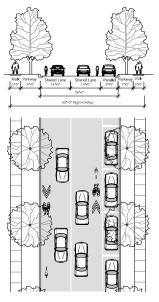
C (7). Ardmore Avenue 62' ROW- Alternative 2.
